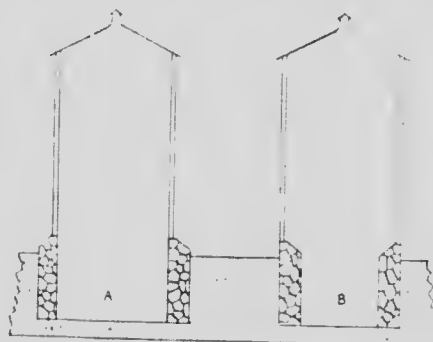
(A) Shows proper arrangement of staves on foundation. (B) Does not allow ensilage to settle uniformly.
